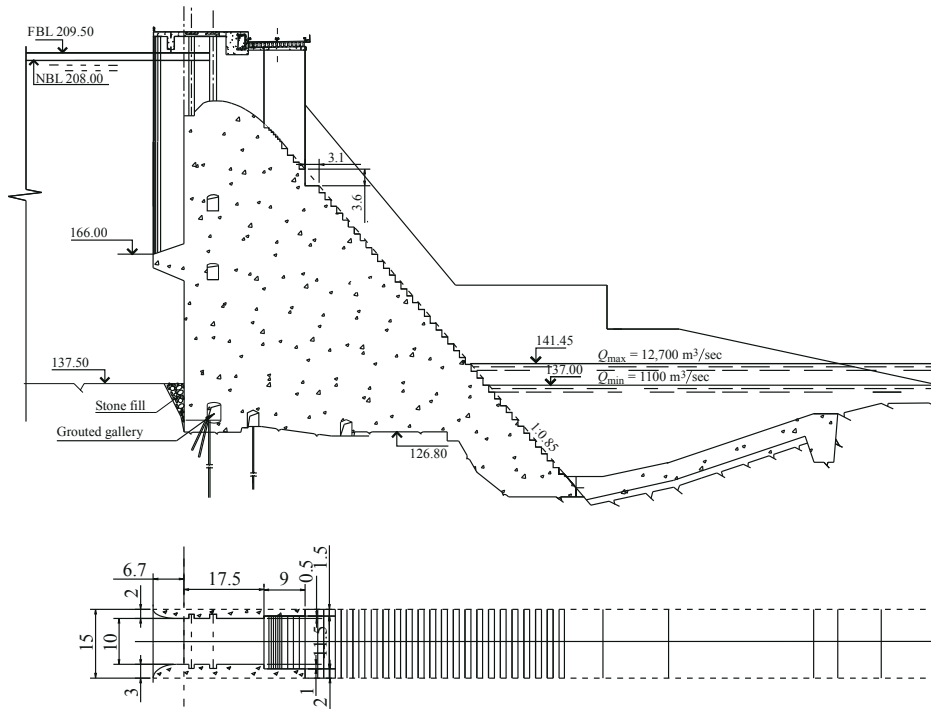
Section and plan of one span of the stepped spillway of Boguchany dam (Toloshinov et al. 2009)
